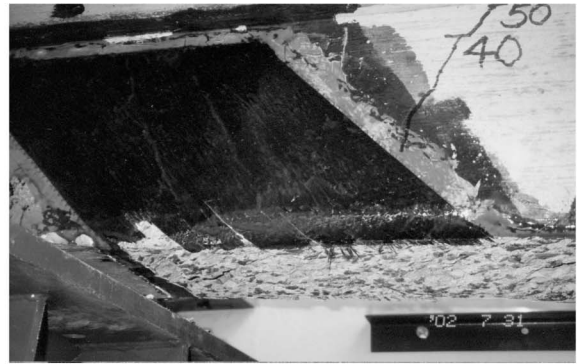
Crushing of compression zone in concrete of Beam TBA2
